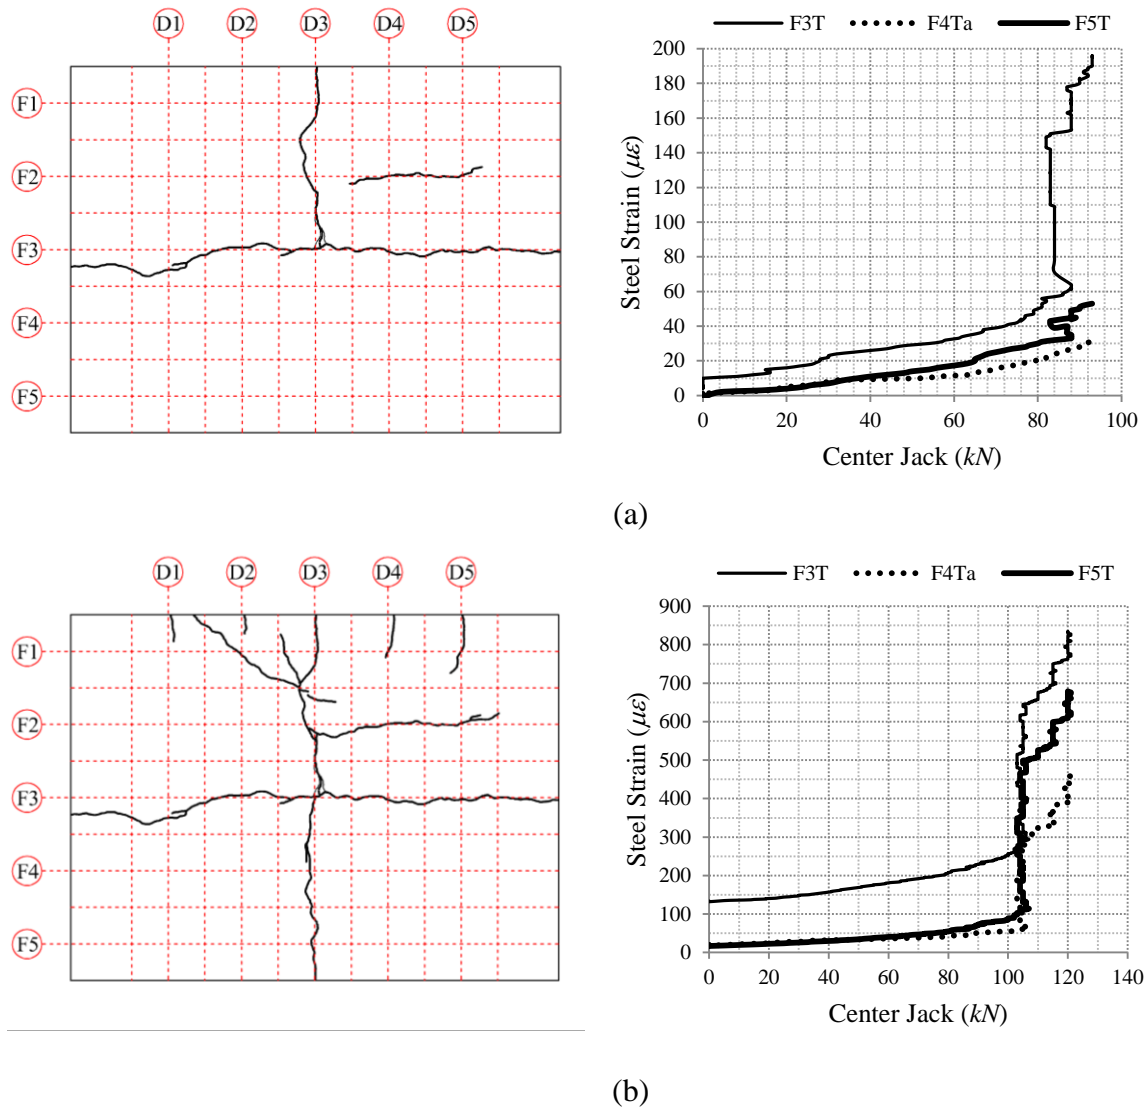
Bond strength damage in two-way systems, crack patterns and steel strain of flexural reinforcing bars in panel B, a) 1st stage, b) 2nd stage
